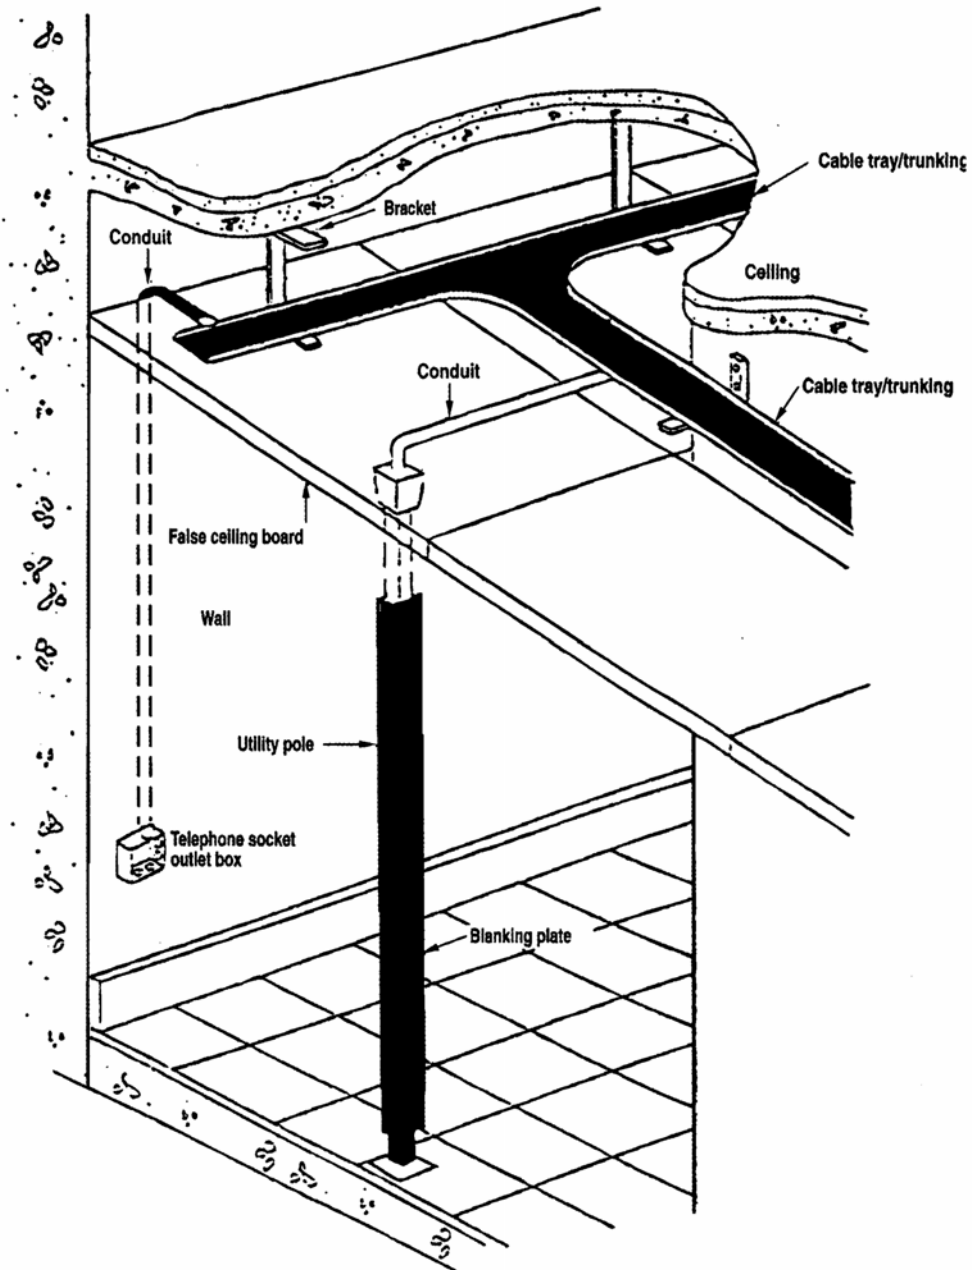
CEILING DISTRIBUTION SYSTEM - TYPICAL DETAIL OF CABLE TRAY/TRUNKING LINK WITH CONDUIT IN UNDETACHABLE FALSE CEILING BOARDS/STRIPS THAT ARE NOT EASILY REMOVABLE
